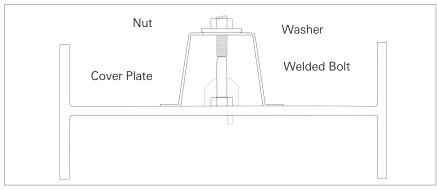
Cover Plate (Model 4000-6) Installation, Side View, Steel Installation Shown
